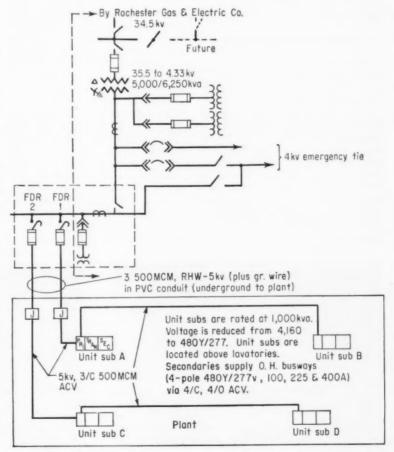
One-line diagram shows basic power distribution. Two gang-operated, fused load-break switches, installed in an outdoor cubicle, provide 4160-volt primary supply to four 1000-kva unit substations in the plant. Underground cables are rated at 5 kv and are installed underground in PVC conduit to plant. Primary wiring in the plant extends to unit subs via exposed ACV steel, interlocked armored cable. Over 18,000 ft of plug-in busway is supplied from the four substations in the plant.
